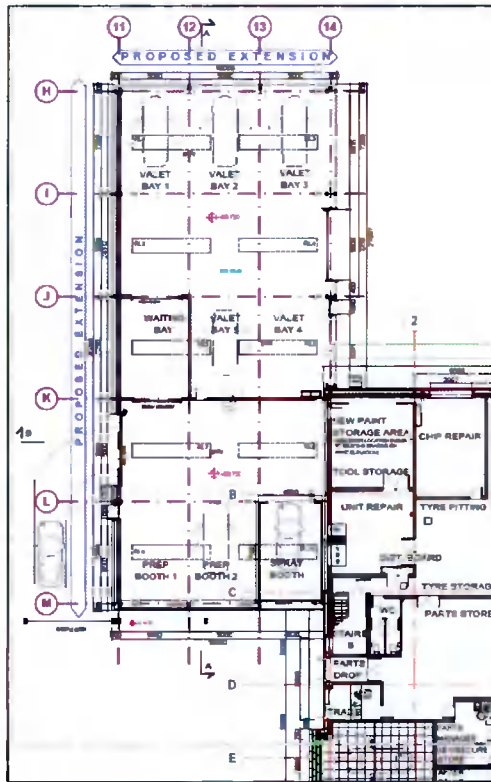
Extract from Node's 'Proposed Ground Floor Plan' Dwg. No. PA_3-00 showing layout of proposed extension and relationship with existing building.
